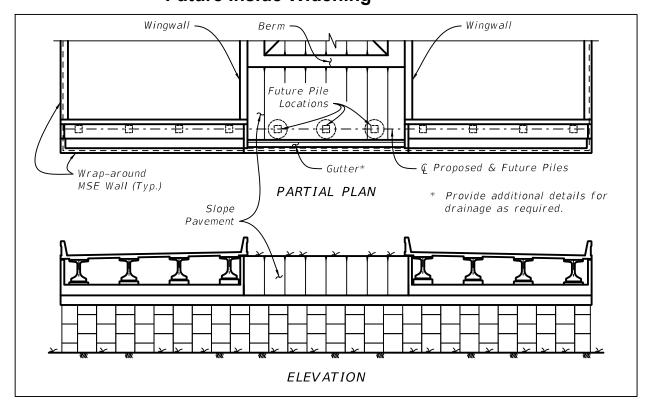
Partial Height MSE Wall Details with Allowance for Future Inside Widening
